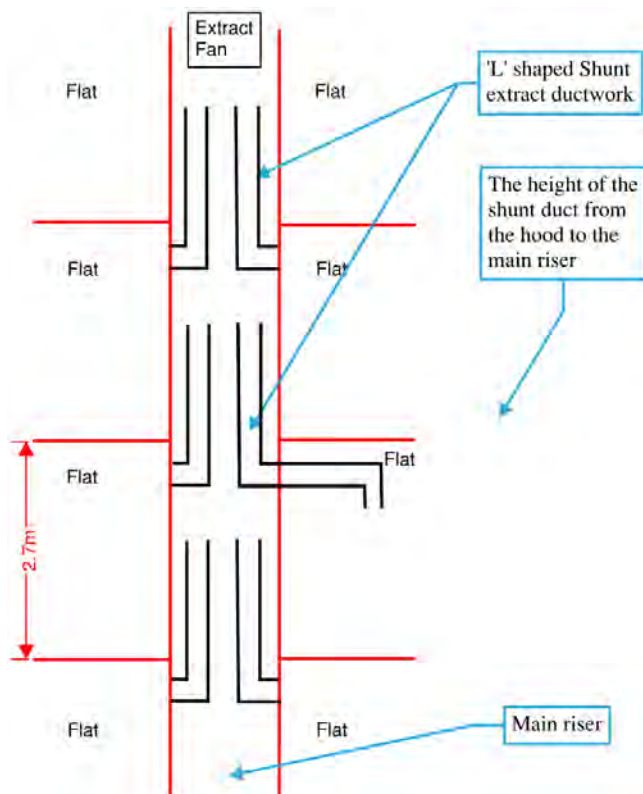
Existing layout of shunt duct system in Cromwell Tower
